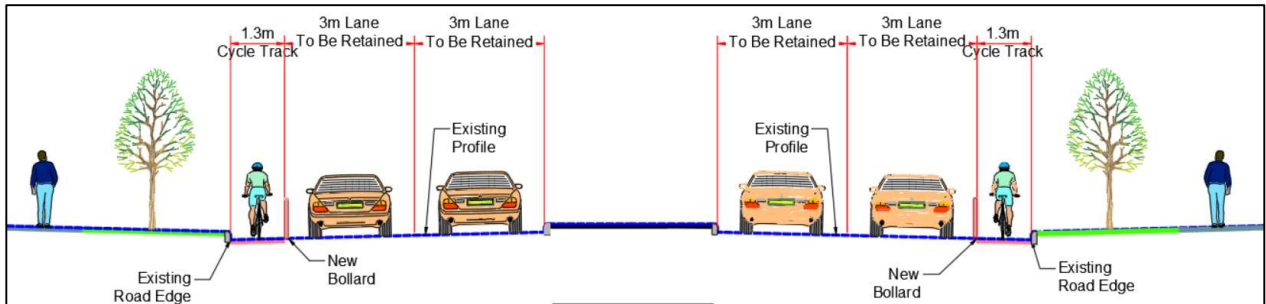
Option 2- Typical Cross-section 1 (Cycle Track with bollards)
